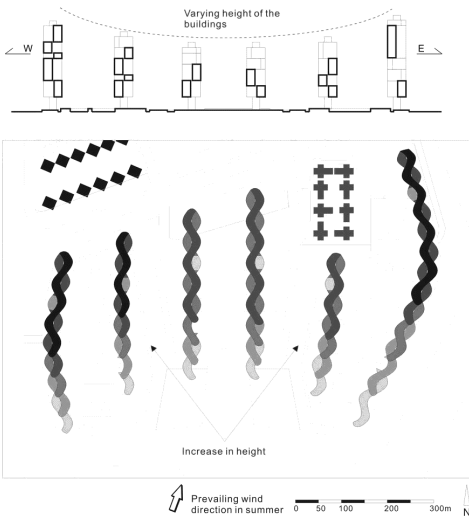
The top section shows some ideas of building gaps. The bottom plan shows how by weaving the building, gaps could be created within the tower itself.
